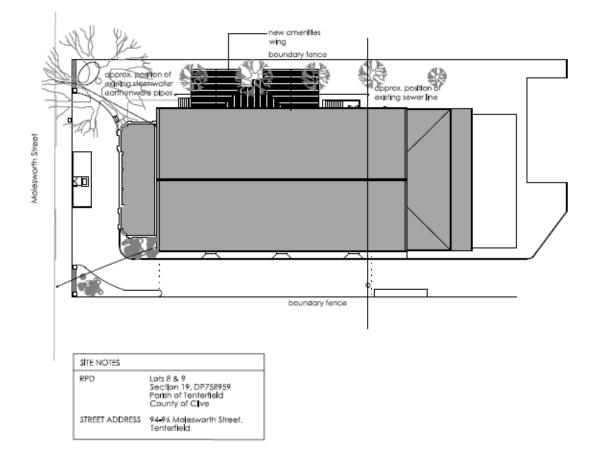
Site plan – extensions proposed to the west of the existing building.
